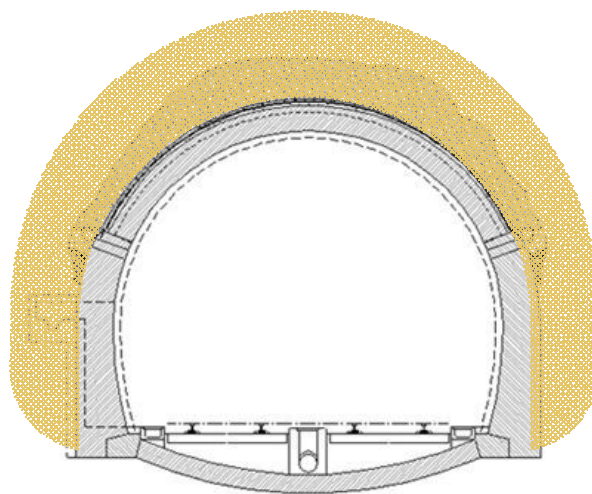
Stabilizing packing by dint of grouting (source Beton- und Monierbau)
